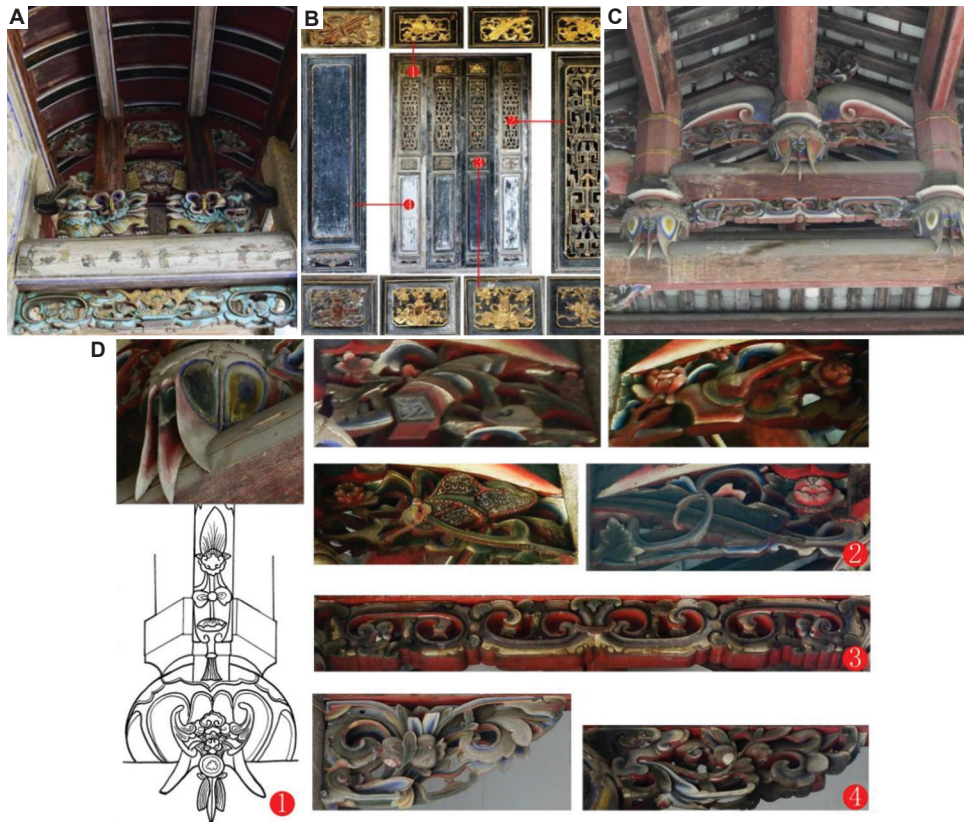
Wooden decorations: (A) Lion bracket (G4); (B) Gold-lacquered partition (G3); (C) Column bracket detail (G3); (D) Bracket-detail schematic showing the ① short column (*gua zhu*) and ②③④ interlocking elements
